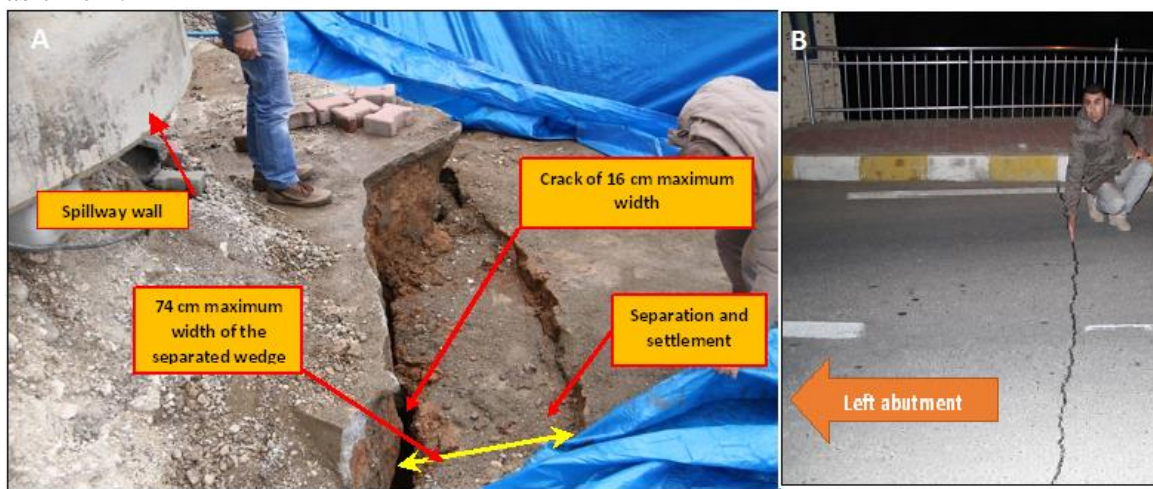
(A) The crack at the contact between the spillway and the embankment, (B) Transverse crack near the left abutment
